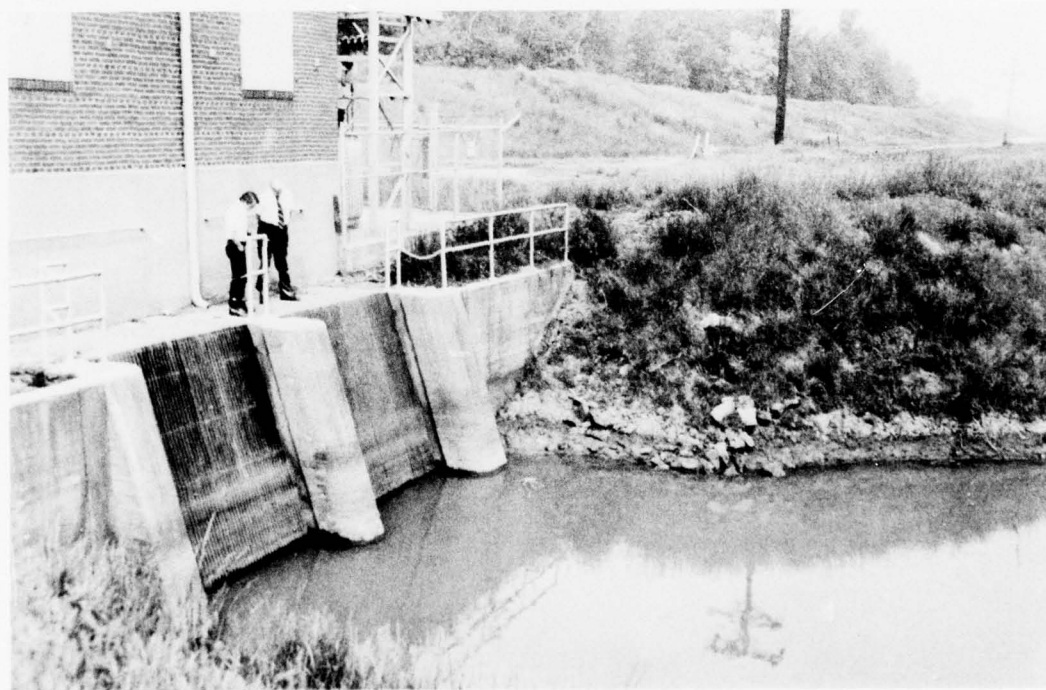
Entrance to sump, 90-deg wing walls, rounded pier noses, pumps not operating
